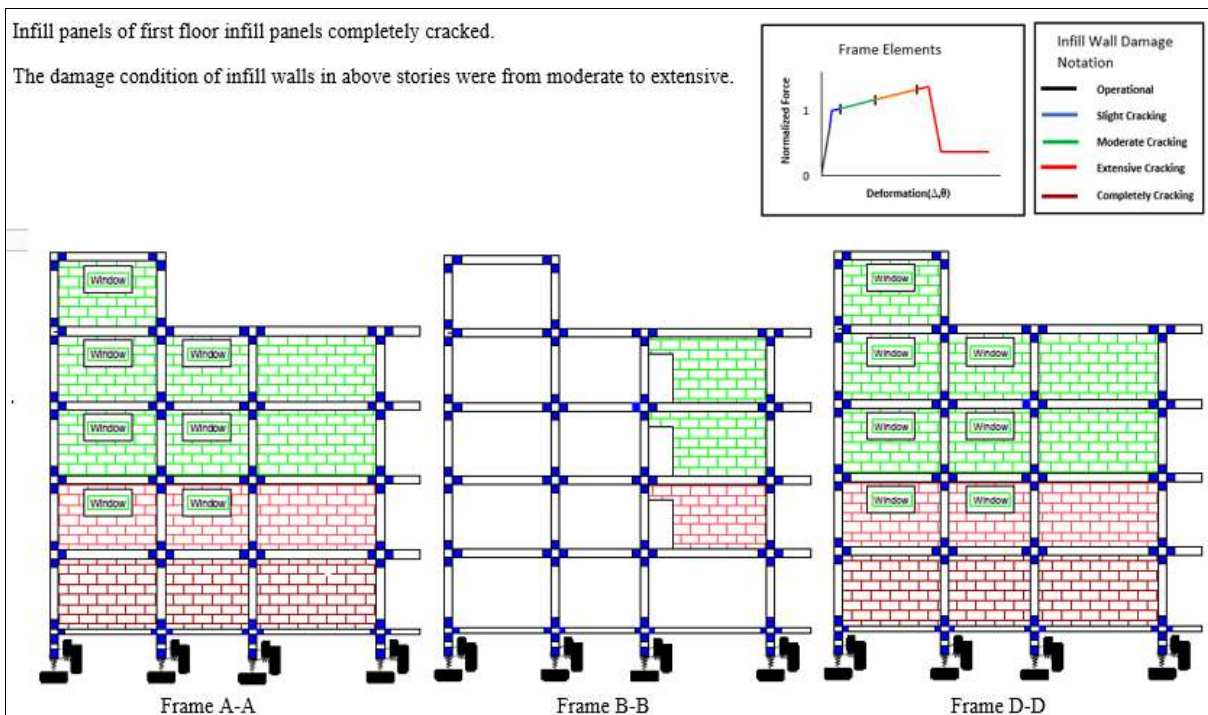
Damage condition of retrofitted case study building with TRM in, Y-direction
